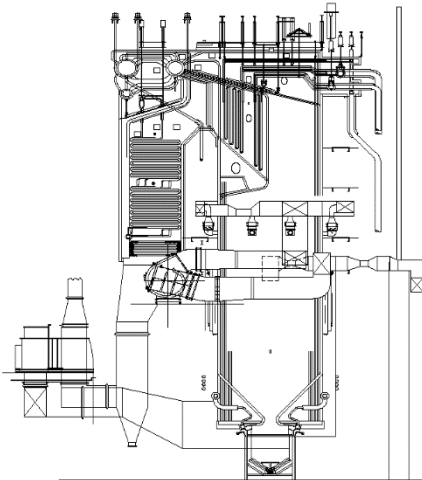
Westover 13 Side Elevation drawing show the Fan Boosted Over-fire Air System Fan "as installed."
